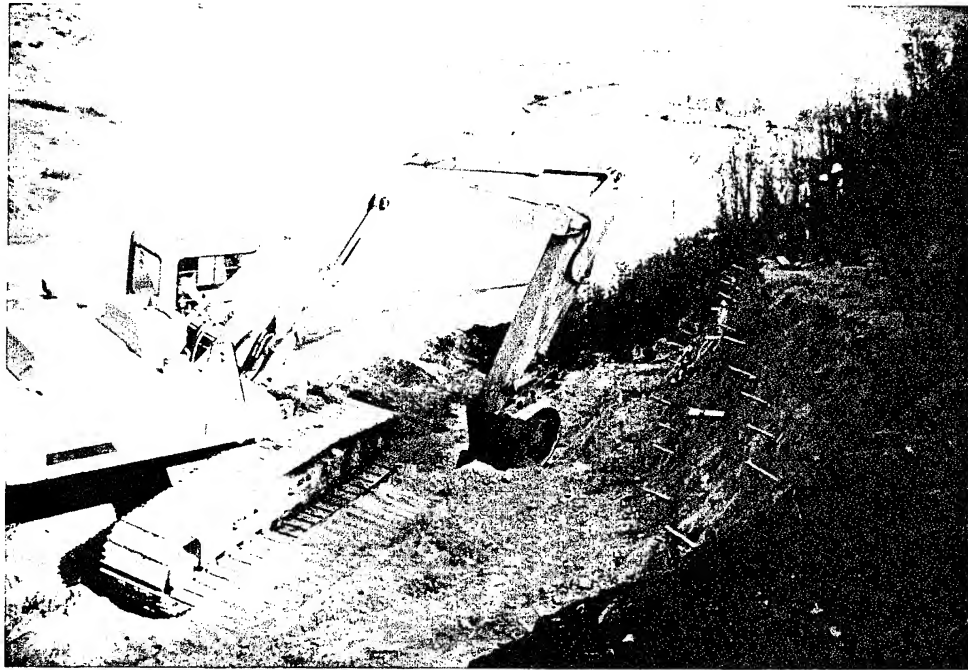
Hitachi EX270 LC excavating downstream portal.
